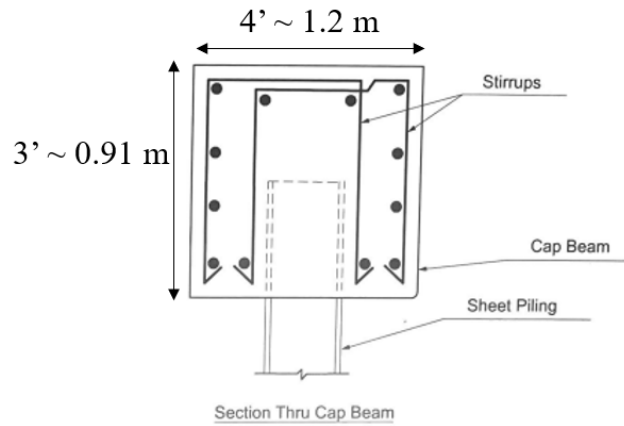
The section of the reinforced concrete cap beam (Nucor Skyline, 2021).
